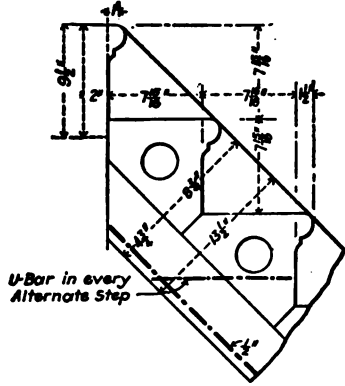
Wide Stairway Construction, New York Rapid Transit R.R.
